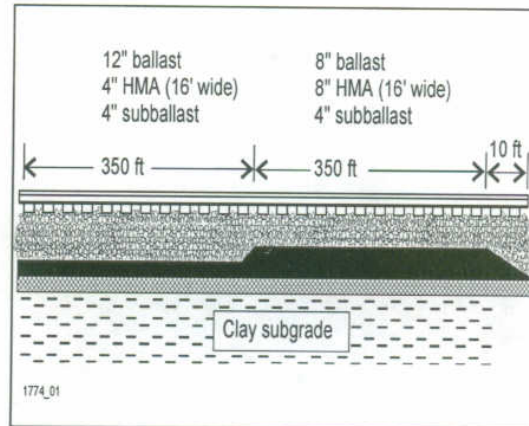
Longitudinal Cross Section of HMA Test Track
